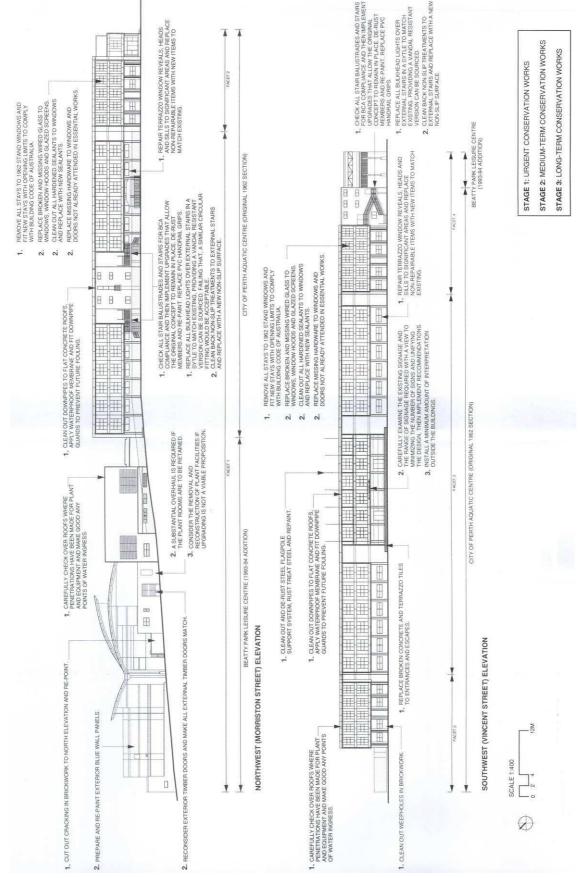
Beatty Park Leisure Centre – NW & SW Elevations (Conservation Works).
